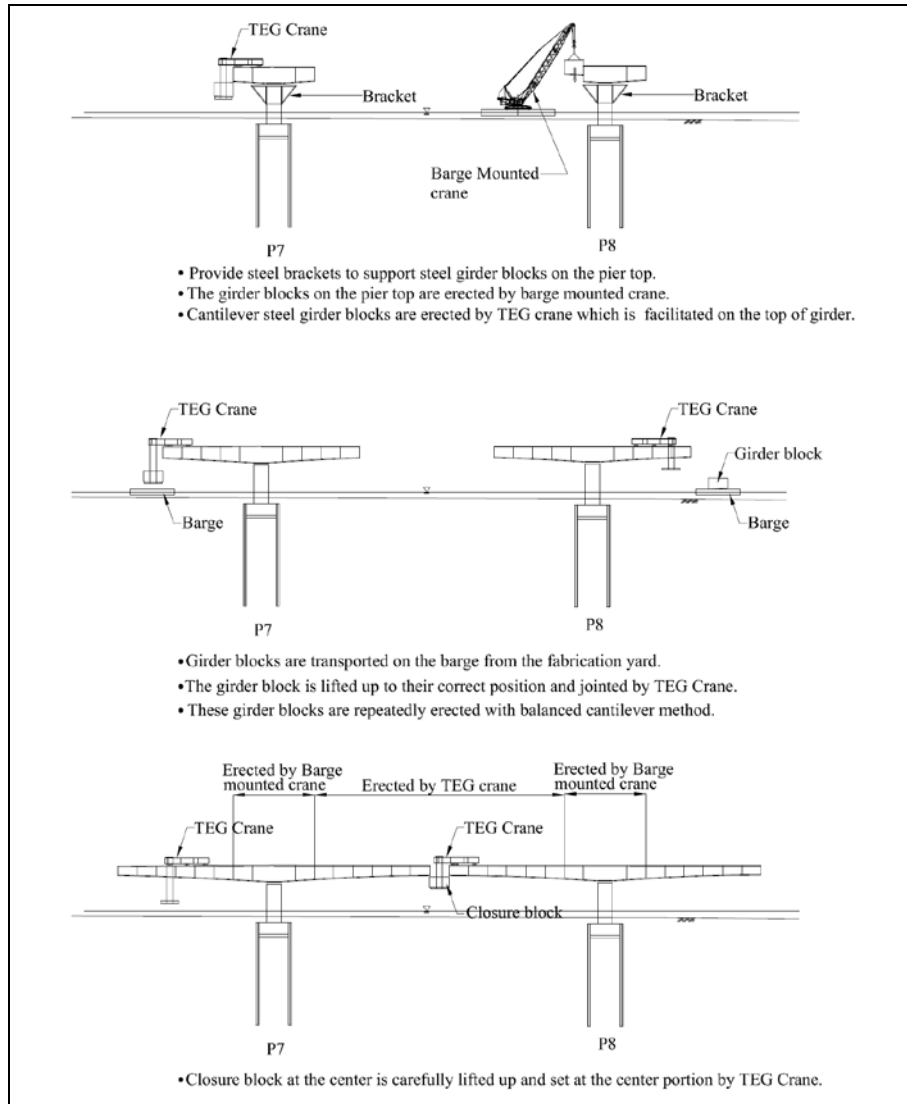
Construction Procedure of Steel Cable Stayed Bridge
